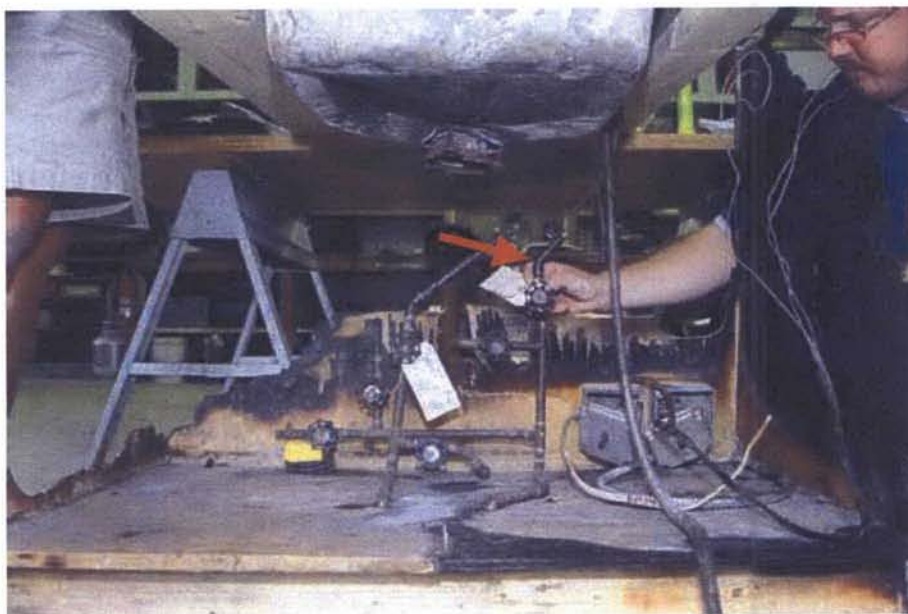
Photograph showing the area under the kitchen sink where the detached valve and connected copper tube would have been located prior to the fire. The red arrow denotes the separated brass valve/copper tube assembly shown in Figure 1.
